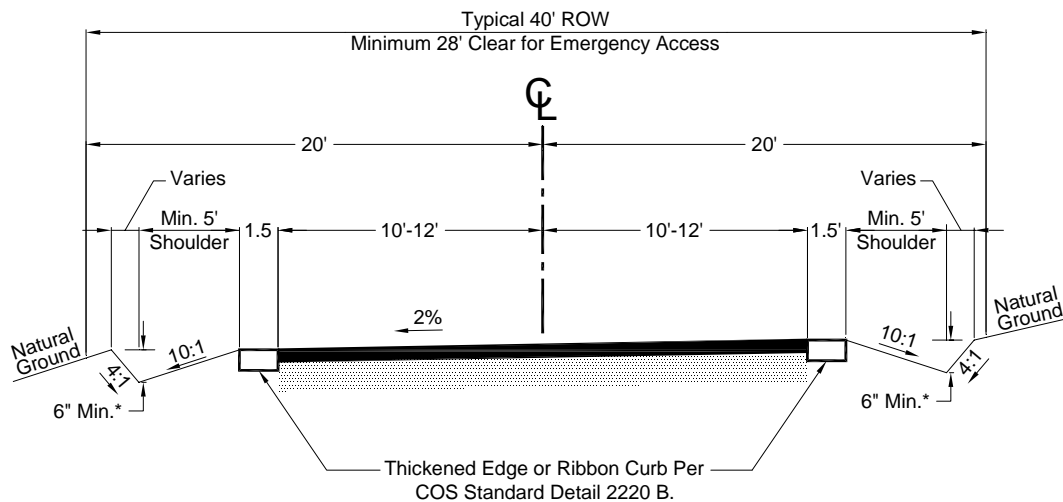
TYPICAL CROSS SECTION FOR ROADSIDE DITCHES
